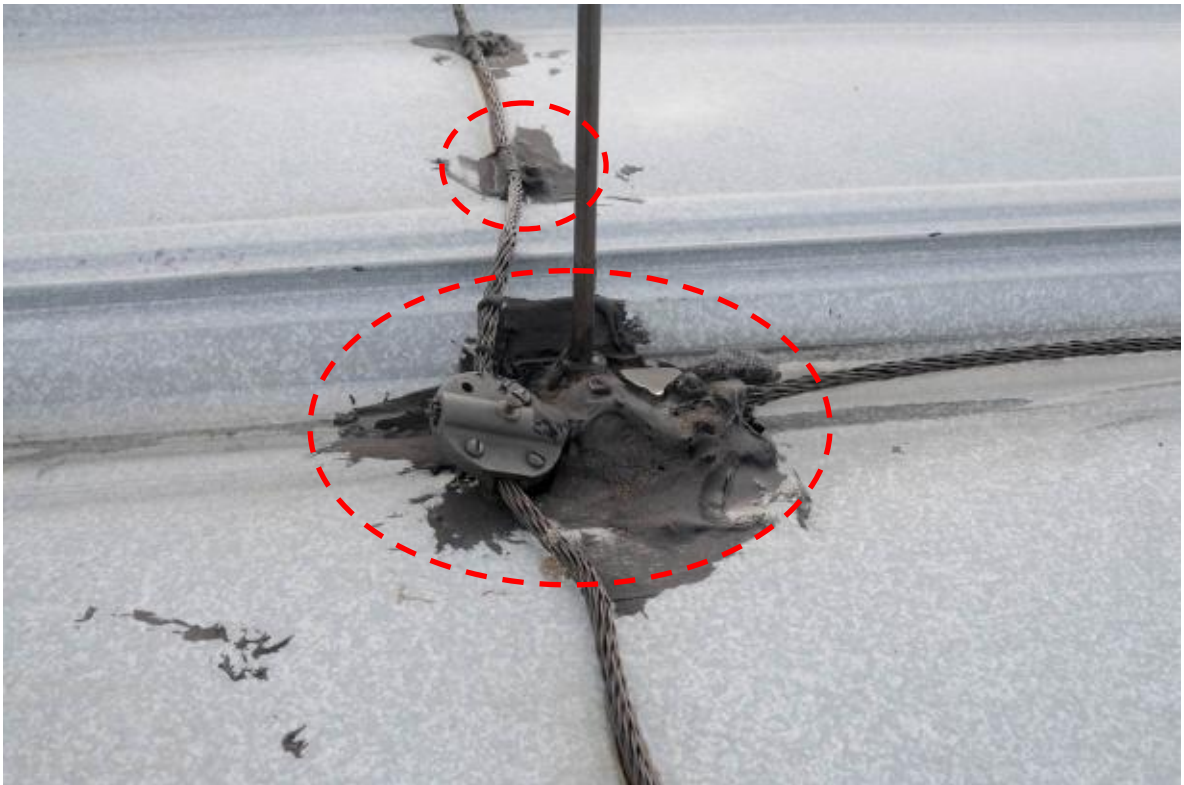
Typical metallic paint and asphalt mastic applied at the base of an exhaust stack. All asphalt and metallic paint material to be removed prior to installation of new bituminous membrane flashings.
